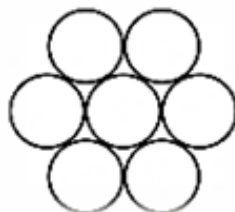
Construction of a seven-wire reinforcement rope 1×7
